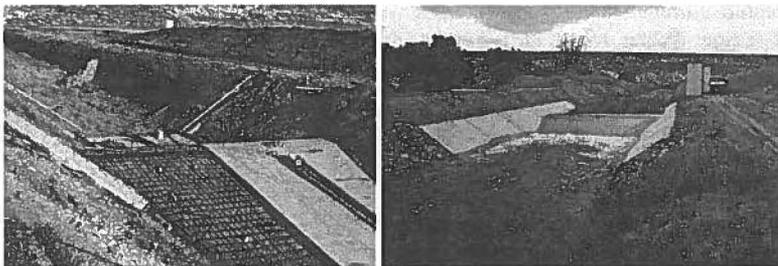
Construction of a Large Broad-Crested Weir in an Earthen Channel.
